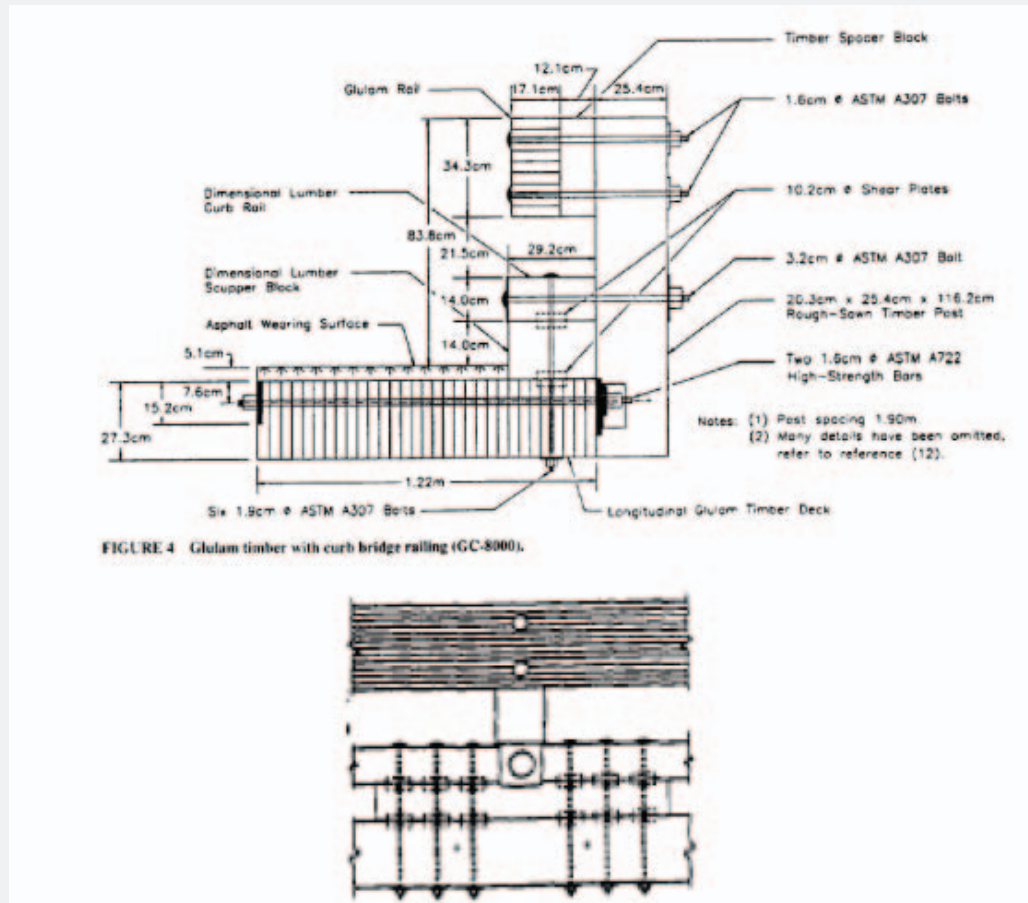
Glulam timber with curb bridge railing (GC-8000).
